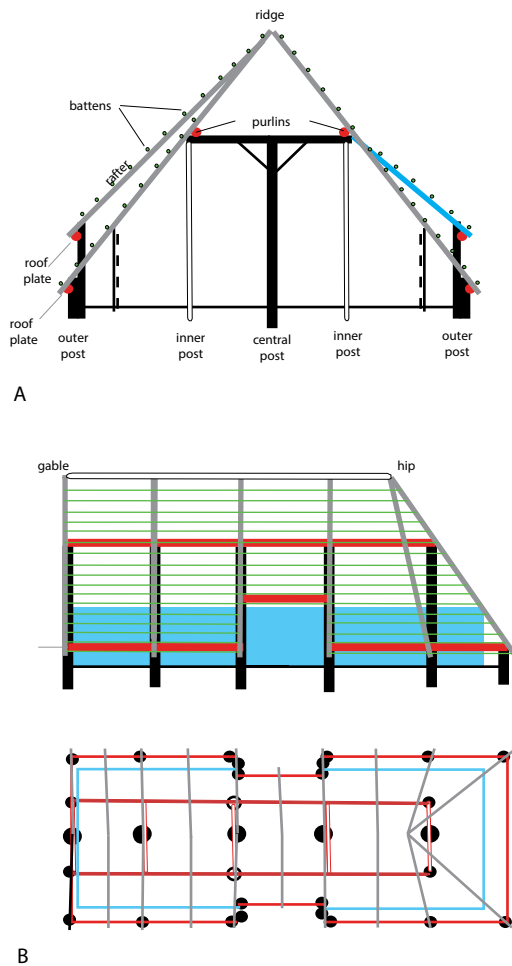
Schematic reconstruction of an (Iron Age) house with a roof resting on posts outside the wall. A: front side. B: side view and top view. Drawing H. Fokkens.
